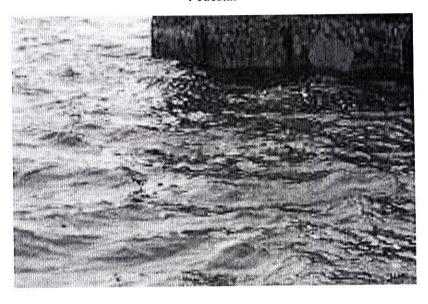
Photo 54 Appendix D Portion of Pier Displacement to the North, Pier 13
